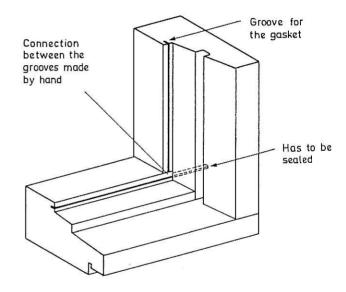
Corner connection of wooden window frame, with grooves for the gaskets
